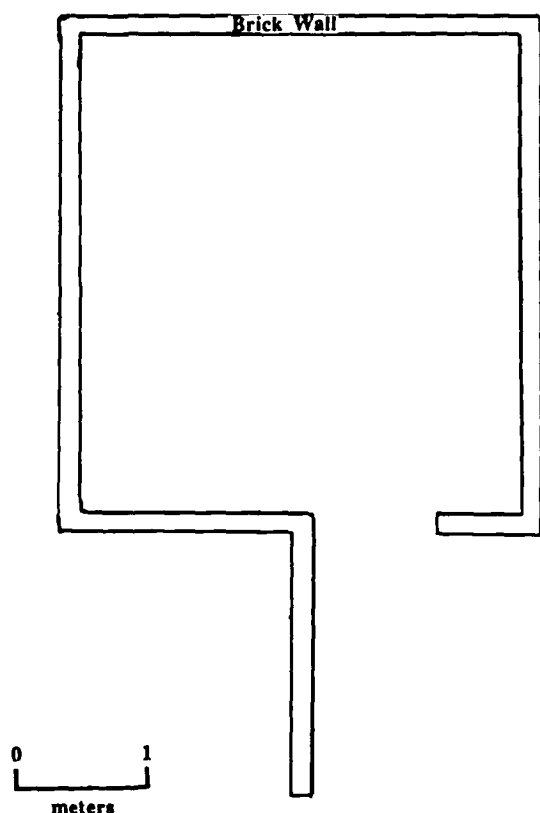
Plan view of Feature 1 (root cellar) based on wall lines exposed during excavation.
